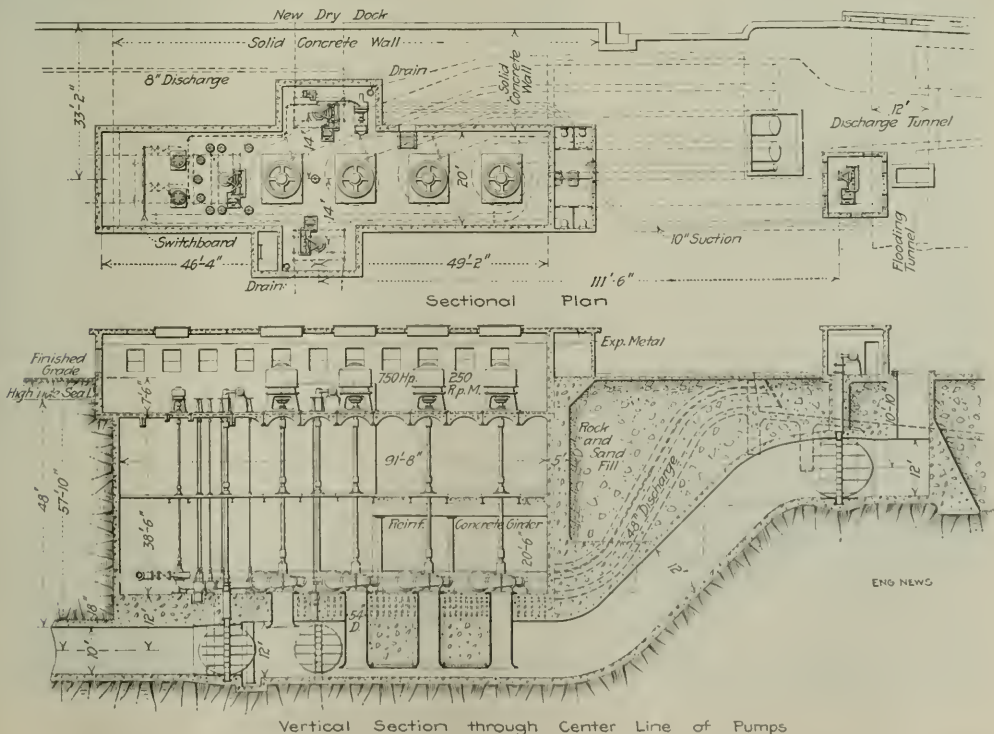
SECTION THROUGH AND PLAN OF PUMP HOUSE, SAN FRANCISCO DRY DOCK
